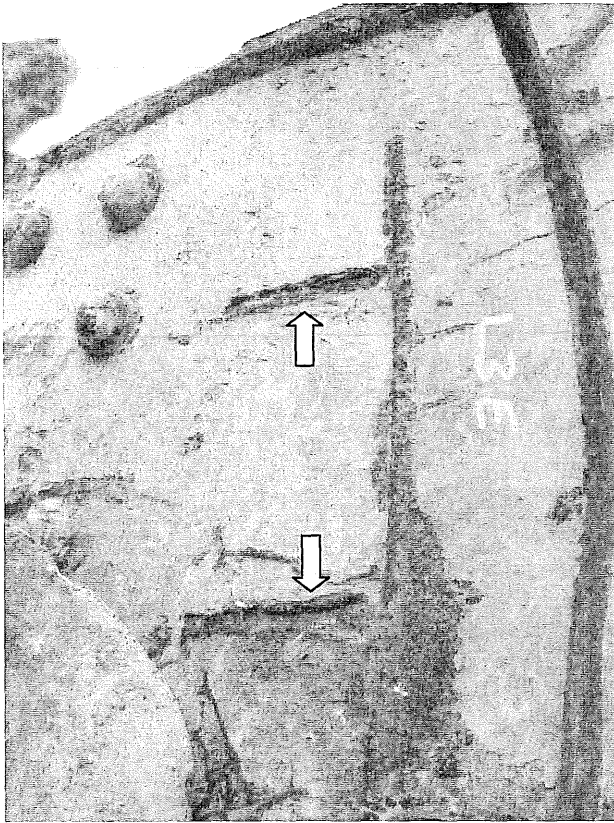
View of box member side plate showing connection locations of displaced diaphragm. Note weld terminations were carefully inspected for cracking. Arrows indicate tab welds.
